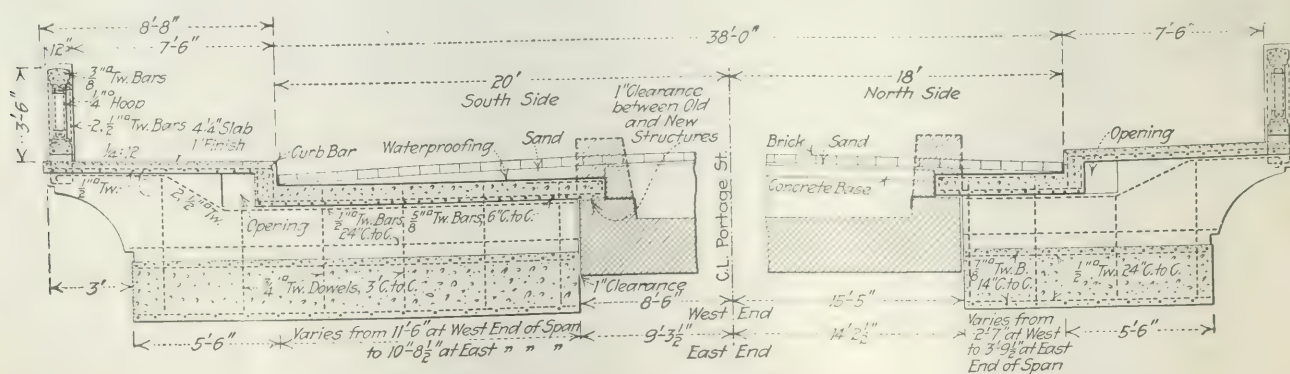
CROSS-SECTION, SHOWING METHOD OF WIDENING BRIDGE AT CUYAHOGA FALLS
